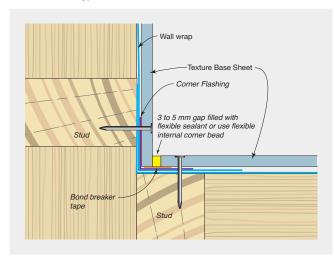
Typical Internal Corner Jointing – refer to coating manufactuerer's specifications
